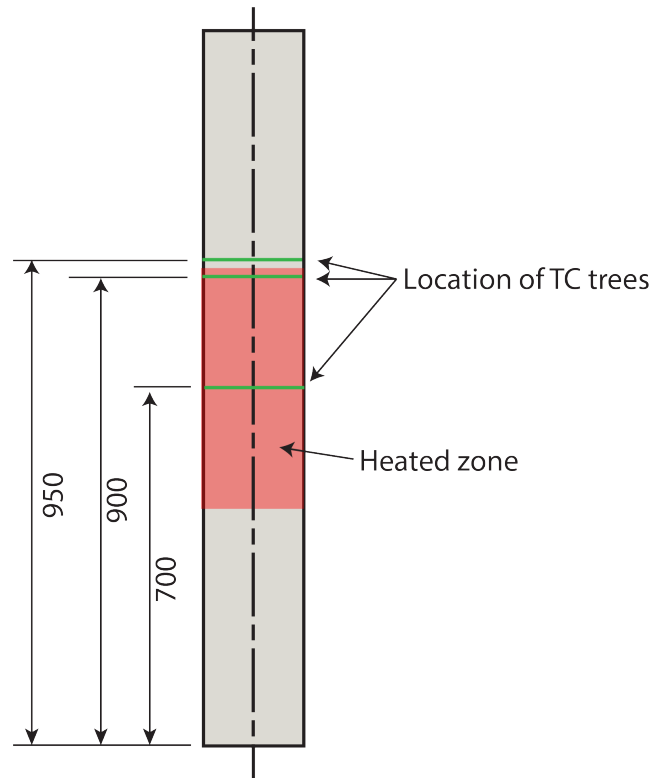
Elevation of the location of thermocouples cast into concrete columns
